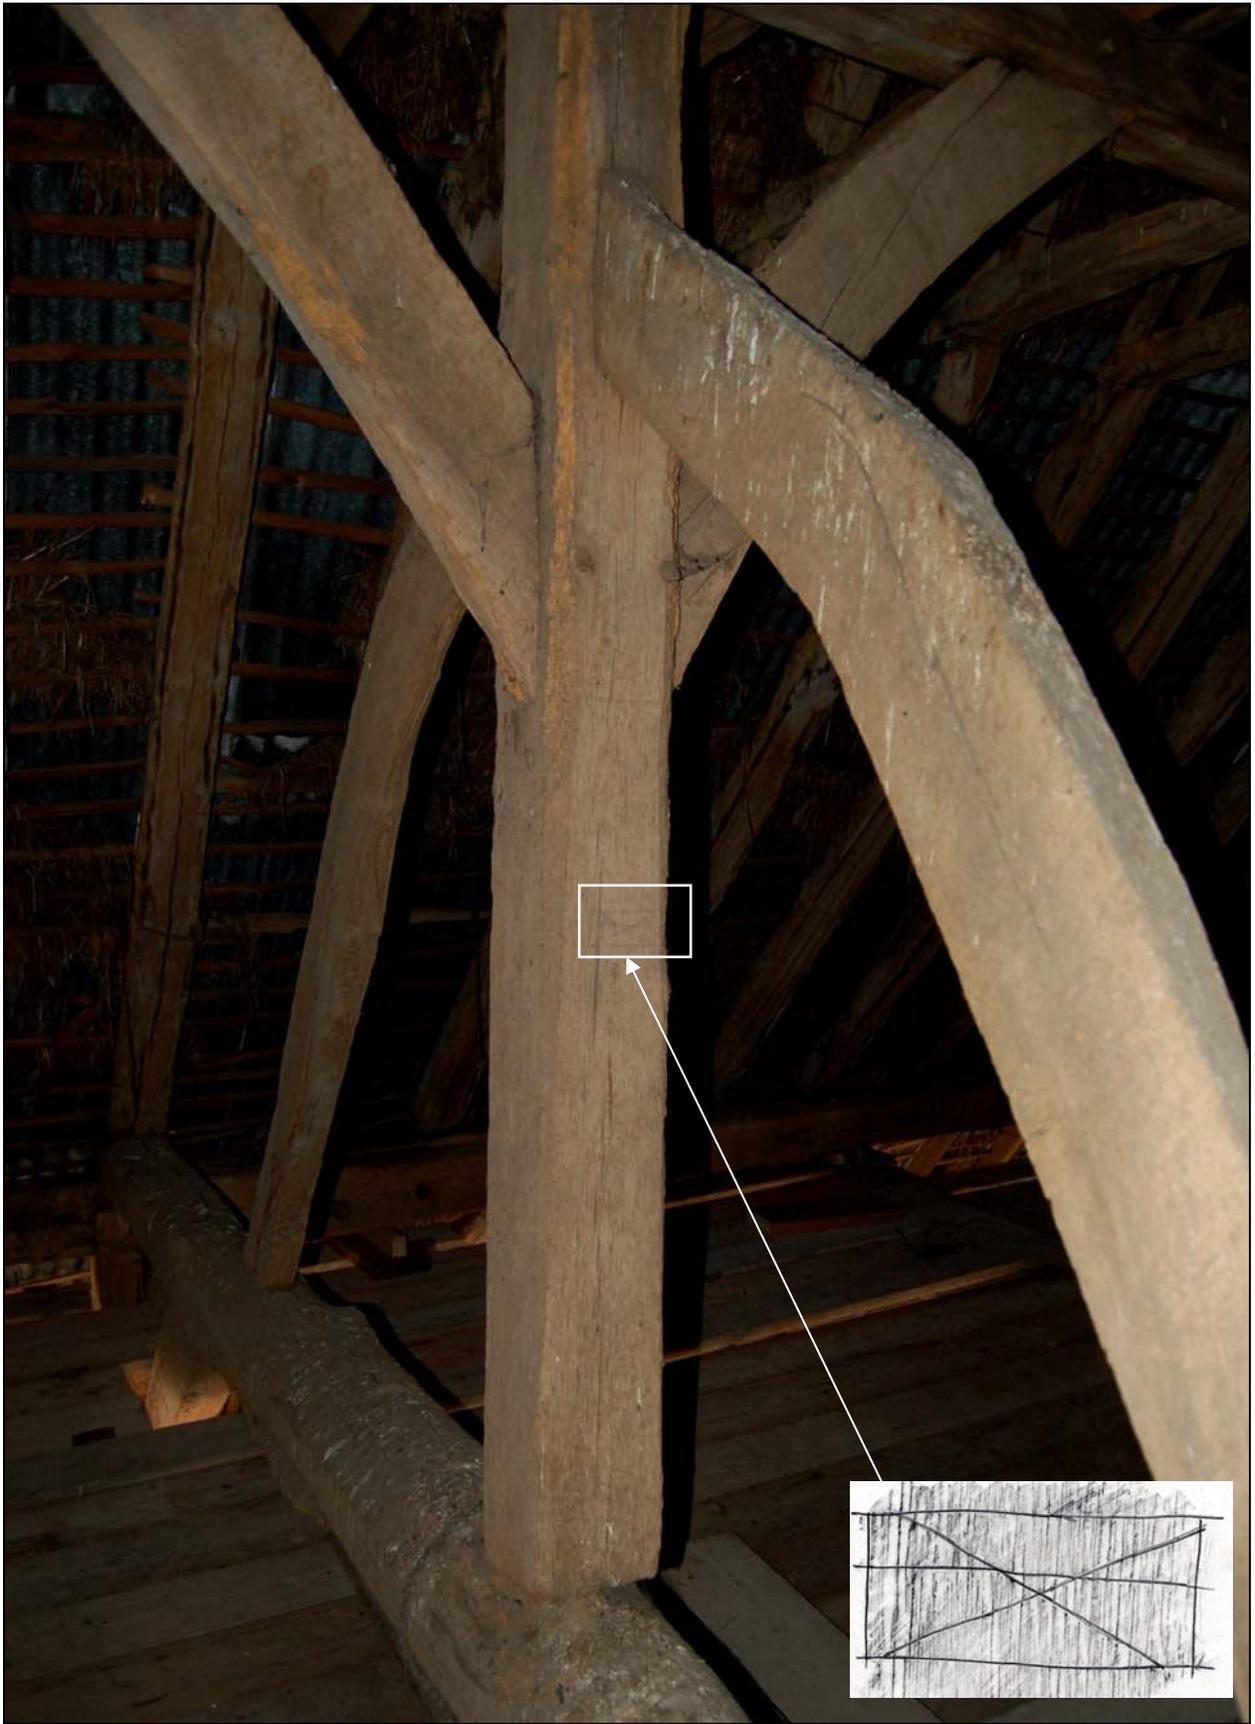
Graffiti mark on truss 5 recorded from scaffold (inset detail at 1:2)
